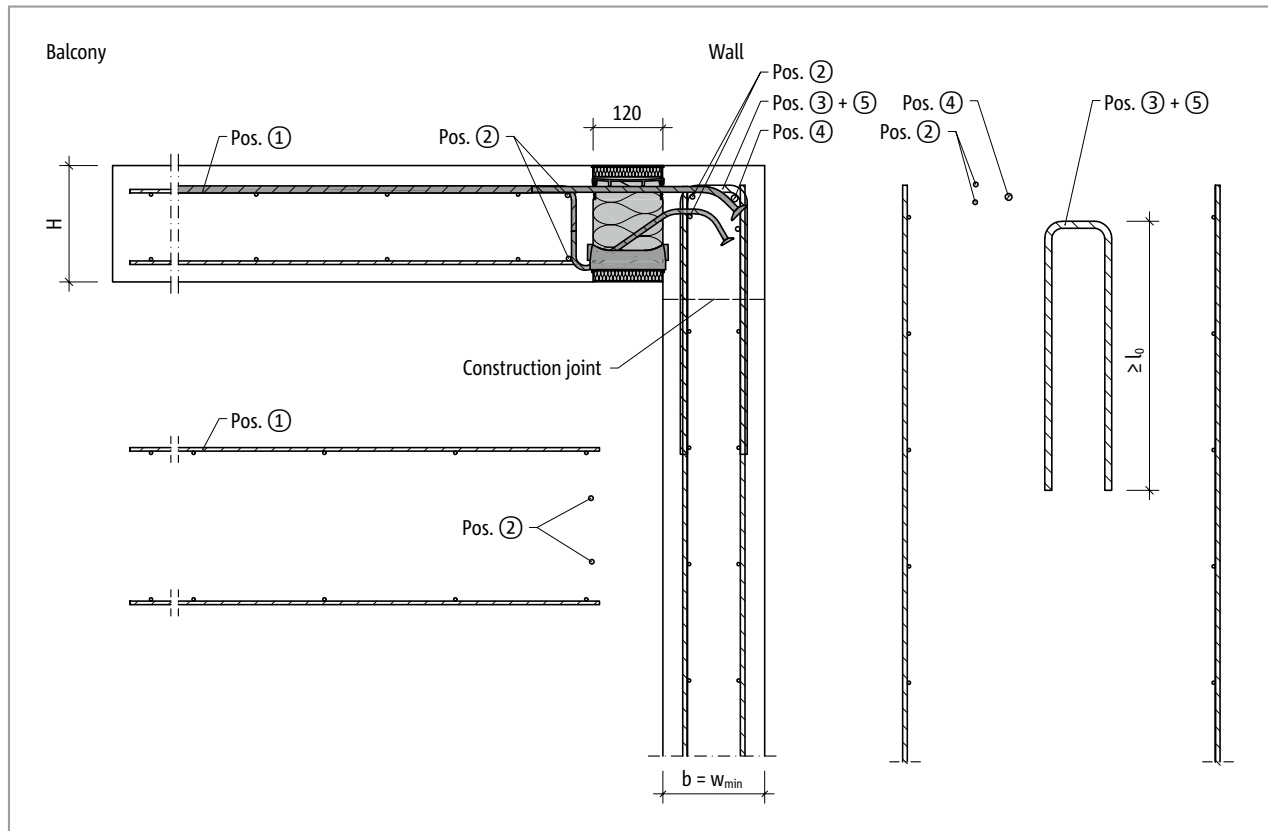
Schöck Isokorb® XT type K-O: On-site reinforcement for wall connection upwards with minimum structural element dimension ( $w_{vorh} = w_{min}$ )
